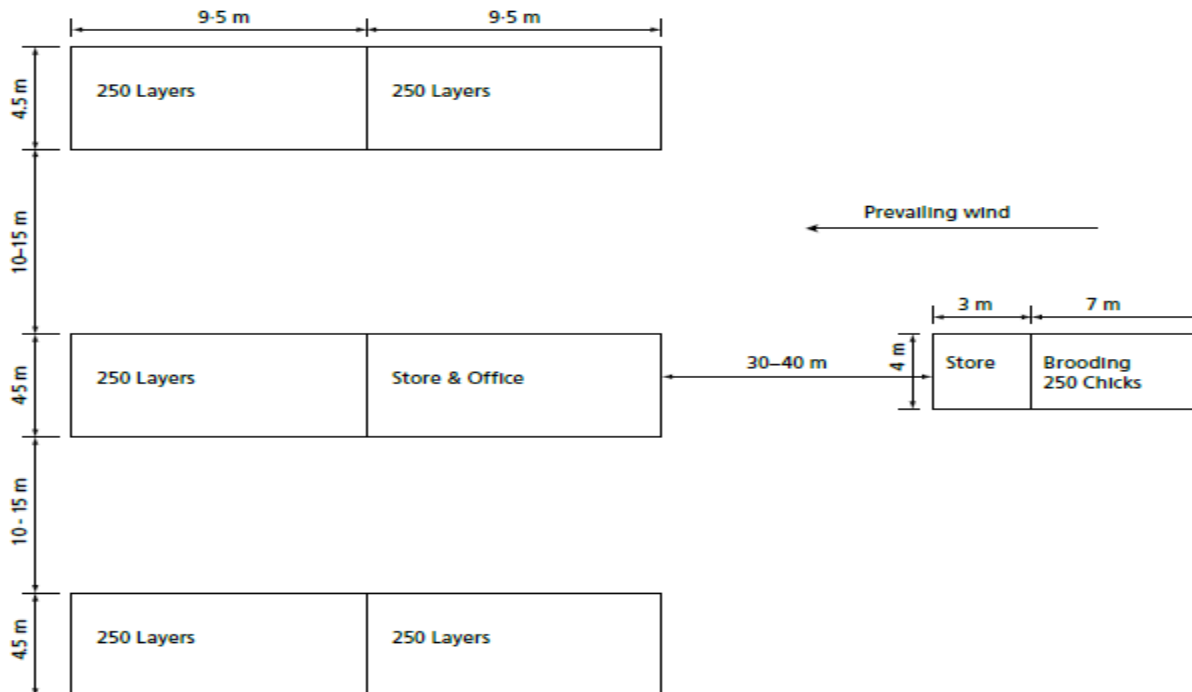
Layout of buildings for 1 000 layers and brooder house for replacements
